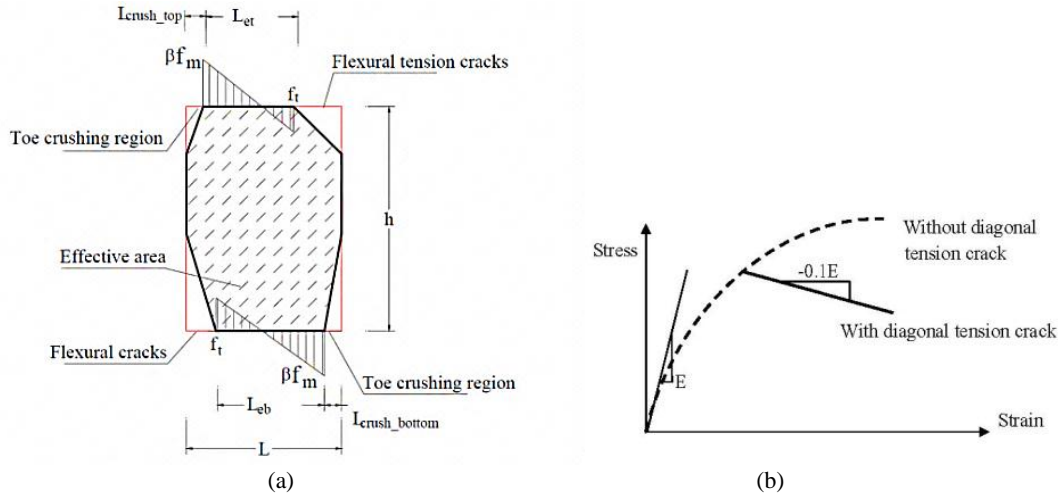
Effective pier model (a); principal compressive stress-strain relationship of masonry before and after diagonal tension cracks (b)
